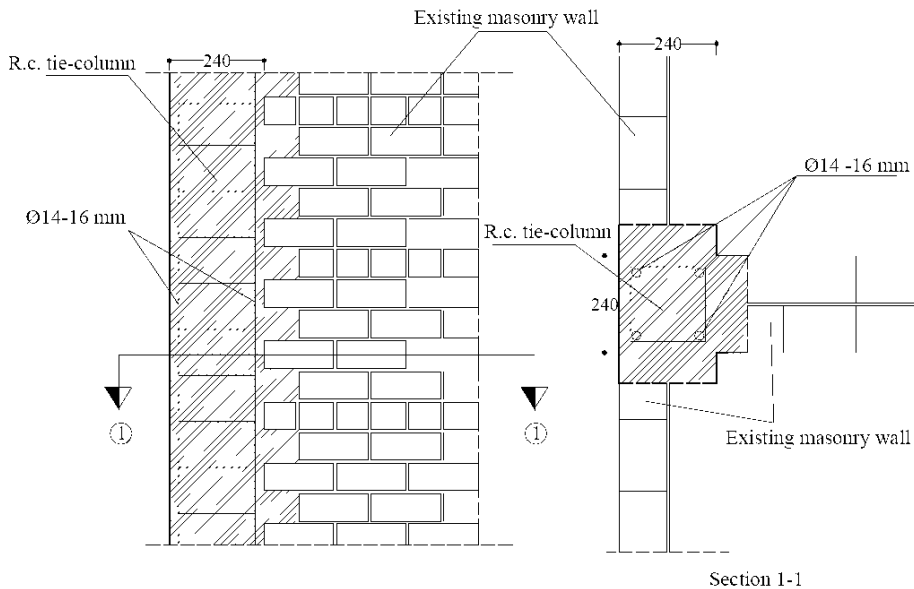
Example of tie-column arrangement in wall intersection [62]
